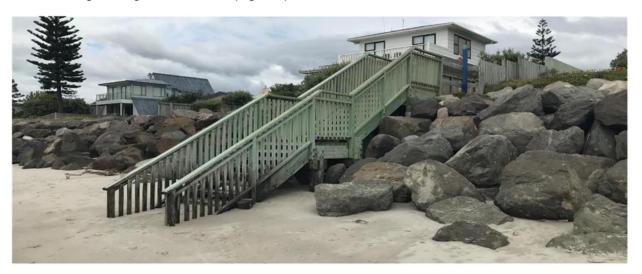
Seawall showing accretion at seawall toe and a public access structure over the wall
